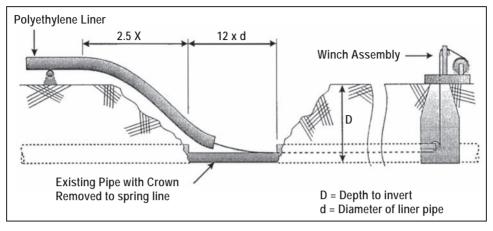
Insertion Shaft Dimensions for PE Pipe with SDR 17 (Bennett and Ariaratnam 2005)
